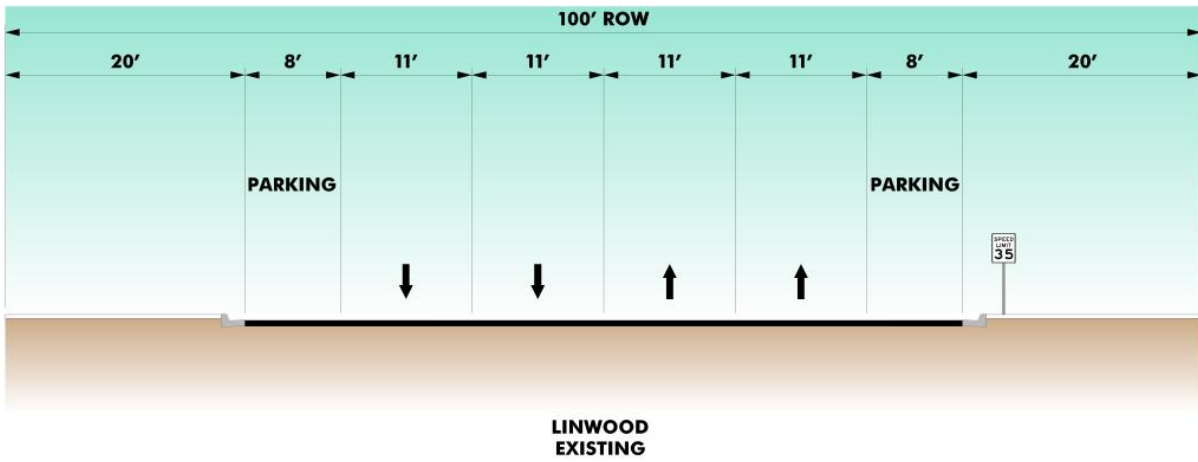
Bus Rapid Transit Linwood Blvd Typical Section
